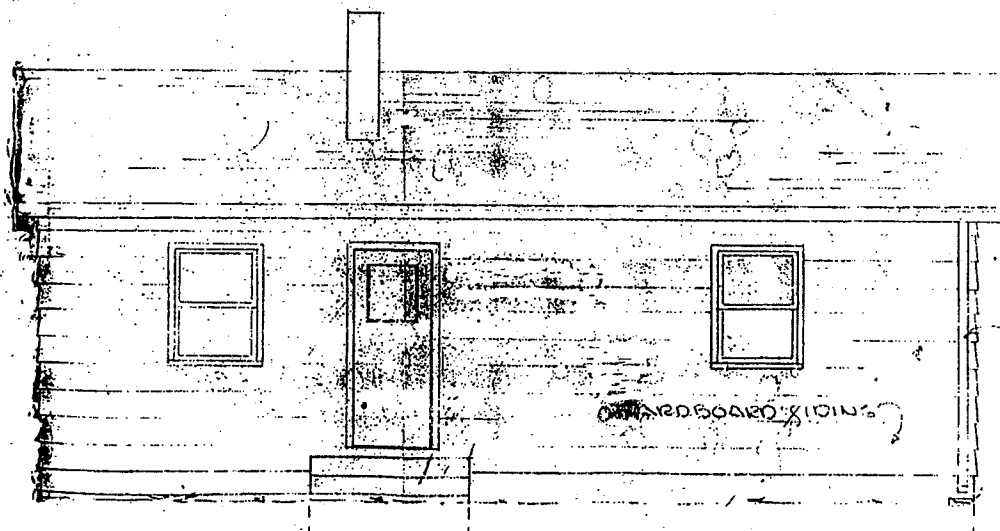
Front Elevation, SD-2 House, Kenel, South Dakota, Standing Rock Reservation.
